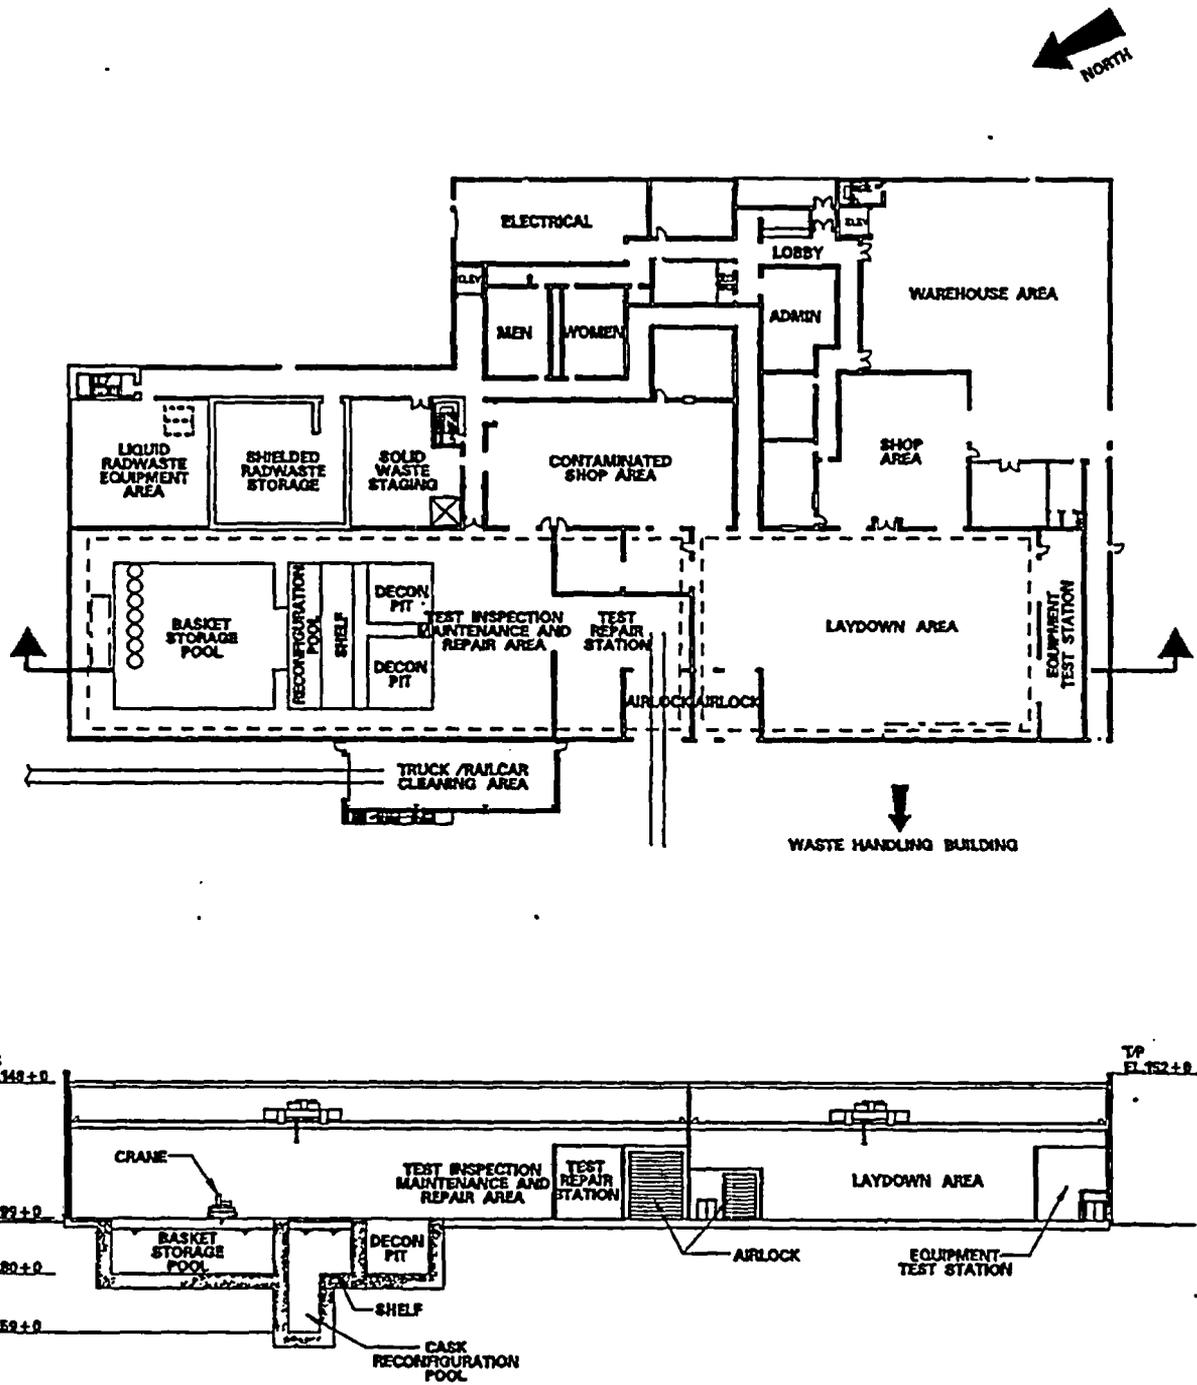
CMF - (Floor Plan and Building Section)
